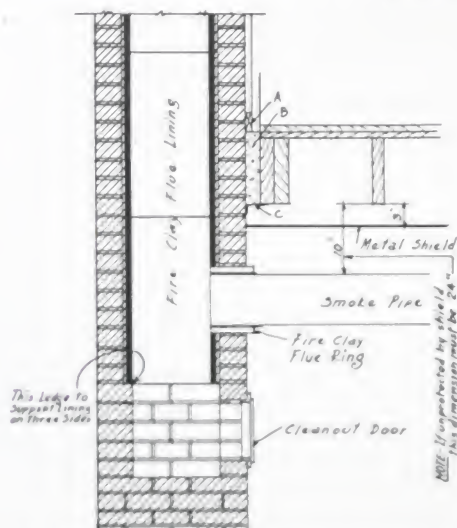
SHOWING LEDGE TO SUPPORT FLUE LINING, SOOT POCKET AND CLEANOUT DOOR. ALSO PROTECTION OF JOISTS ABOVE SMOKE PIPE OF LARGE COOKING RANGES, HOT AIR FURNACES, STEAM AND HOT WATER BOILERS. A=PIECES OF ASBESTOS BOARD BACK OF WOOD FURRING. B=INCOMBUSTIBLE FILLING. C=STRIP OF SHEET METAL OR METAL LATH.
